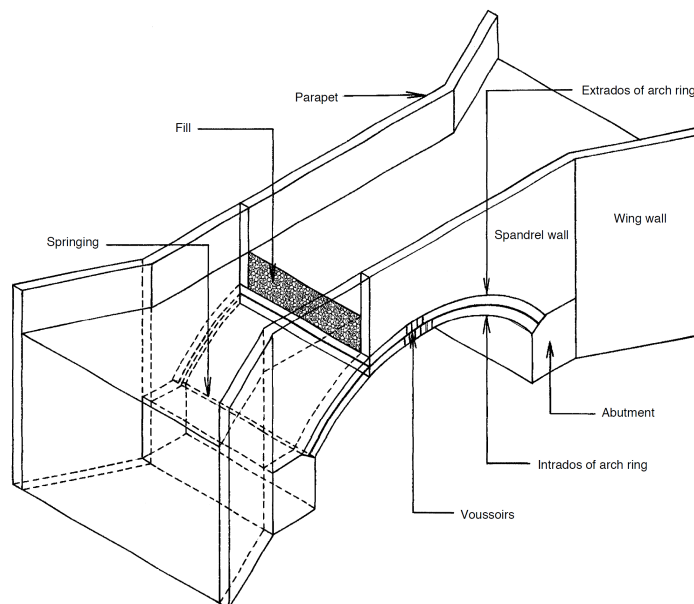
General arrangement of a masonry arch bridge (after Hughes and Blackler (1997))
